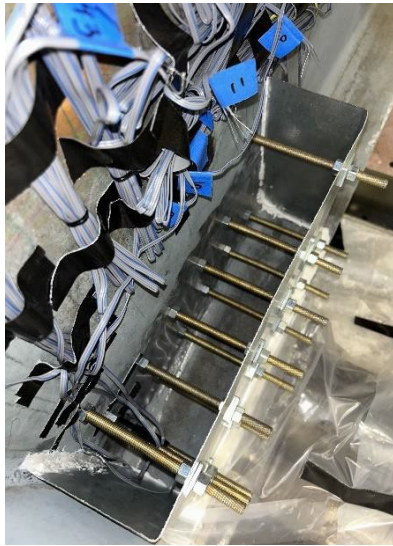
Specimen 4. Details of Sandwich Panel repair assembly.
